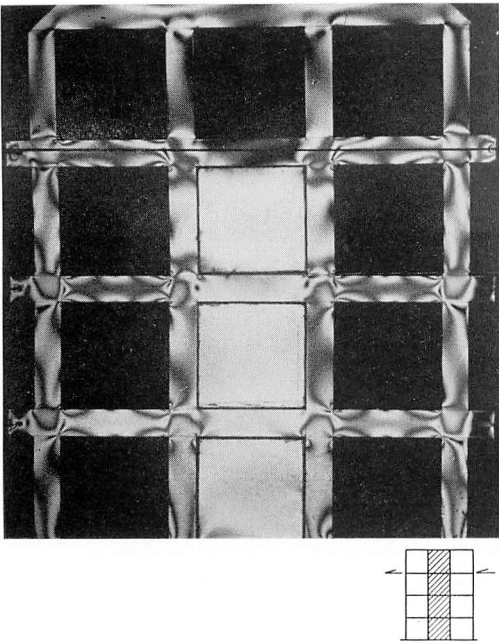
b Isochromatics of Frame with four Wall Panels Subjected to Lateral Forces on fourth Floor Beams
